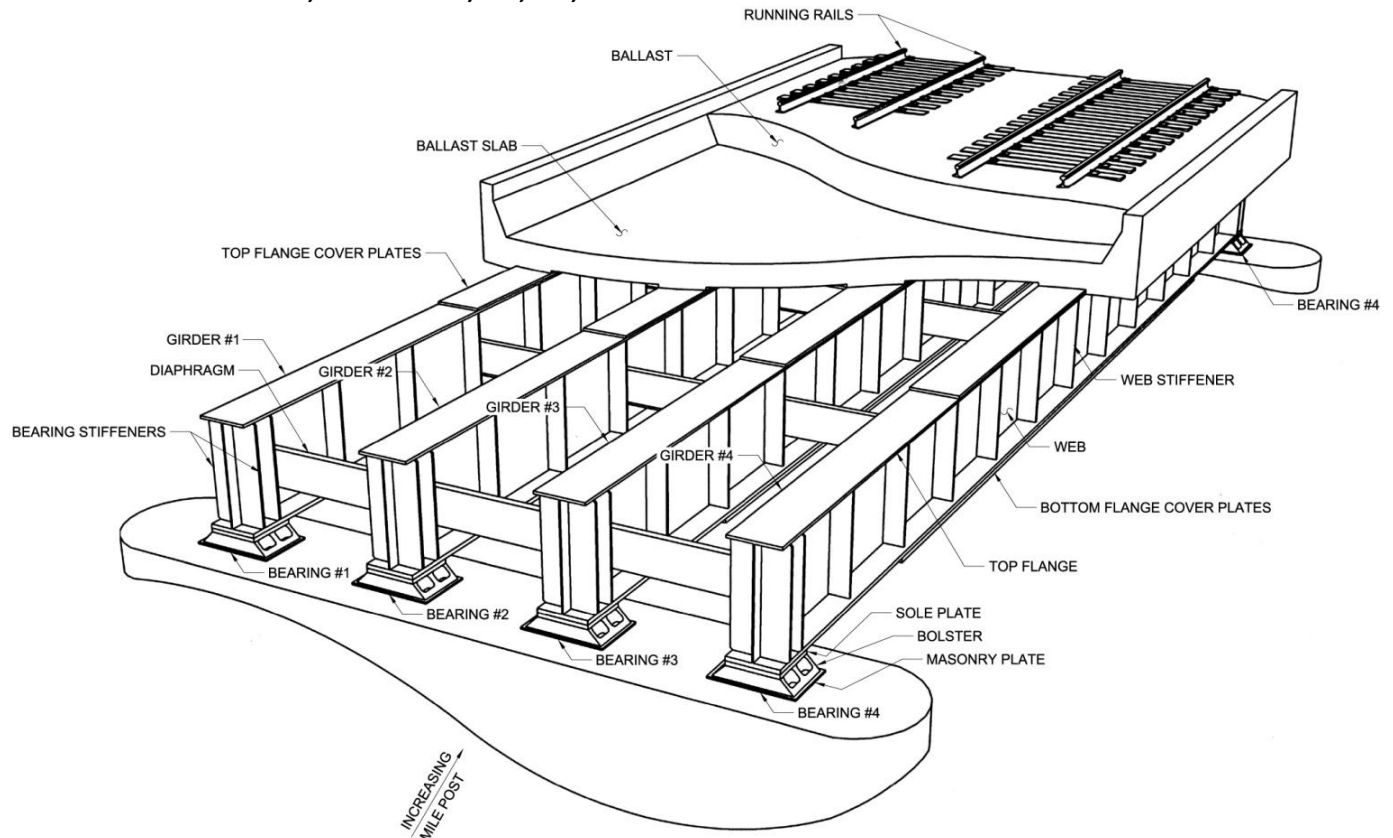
Concrete Slab Ballast Deck on Steel Span Nomenclature
